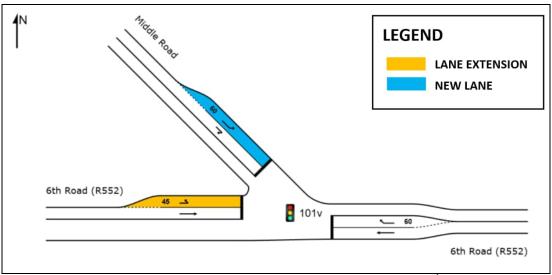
Proposed Geometric Layout of the Middel Road & 6th Road intersection (signalised)
